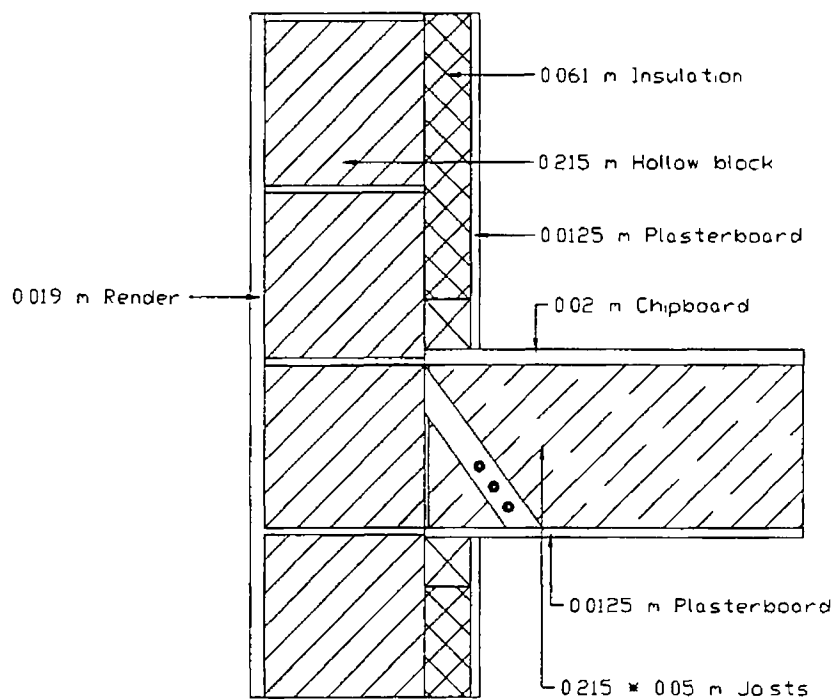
12 2 Semi-Detached Uninsulated Wall at First Floor Level in the Direction of the Joists
